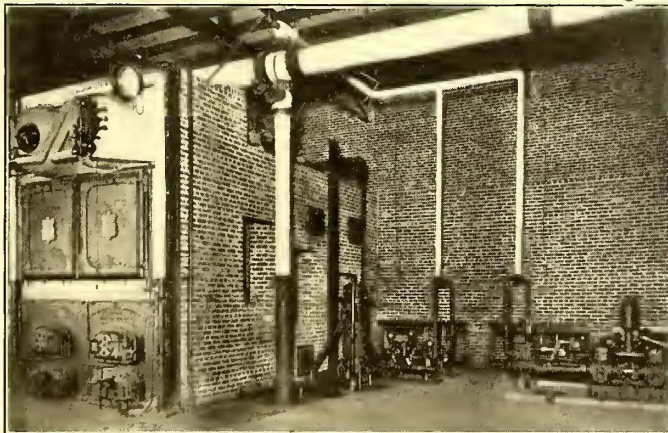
FUEL OIL PUMPS AND FEEDER PUMPS IN BOILER ROOM
